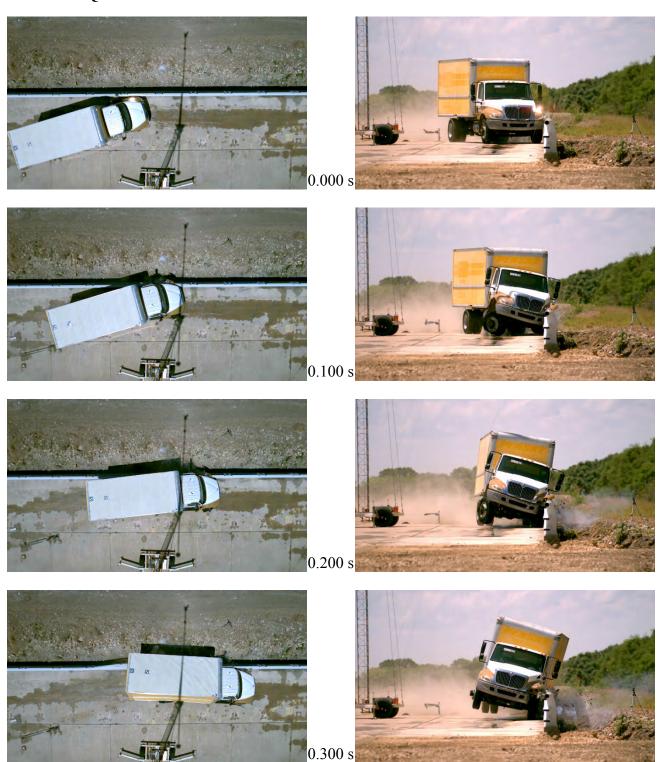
Sequential Photographs for Test No. 490026-4-3 (Overhead and Frontal Views).
